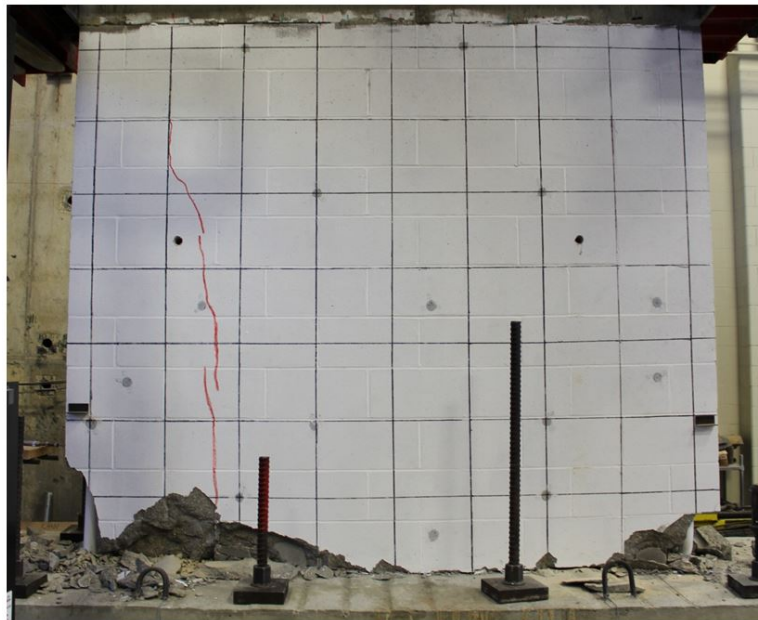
Shear Wall Two damage (vertical shear crack shown in red)
